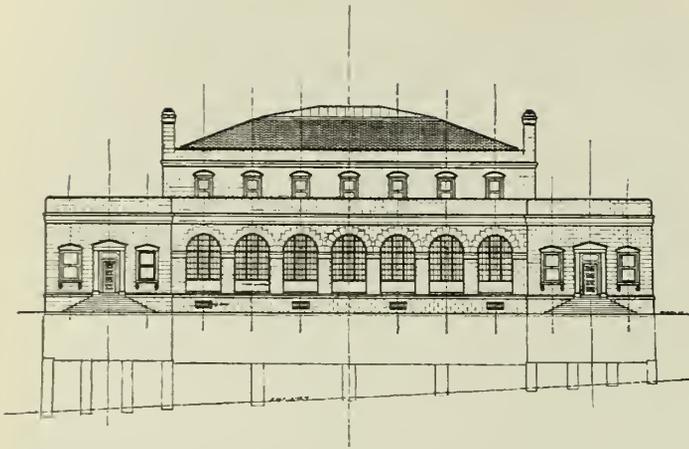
Front Elevation, New Fire Alarm Central Station.
